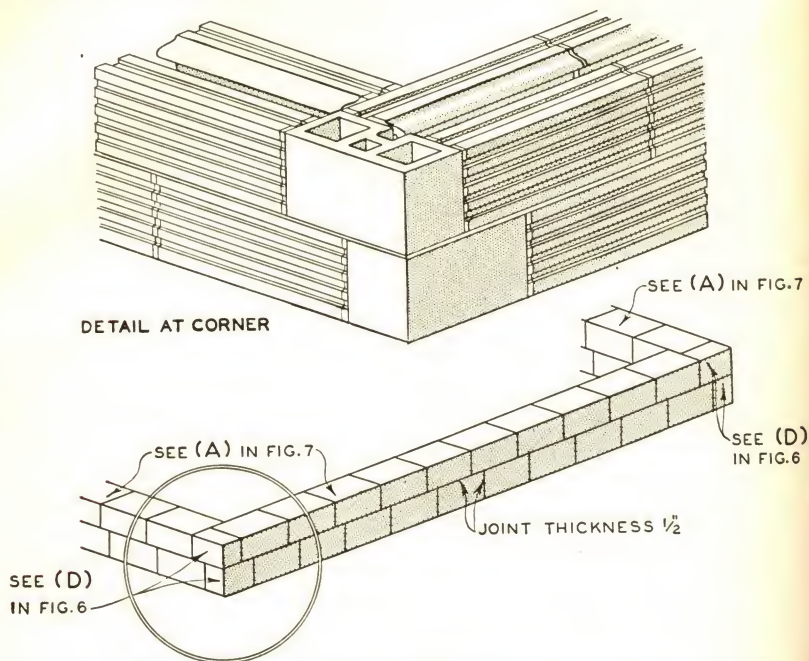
Second or Alternate Course in a Carefully Planned Wall
